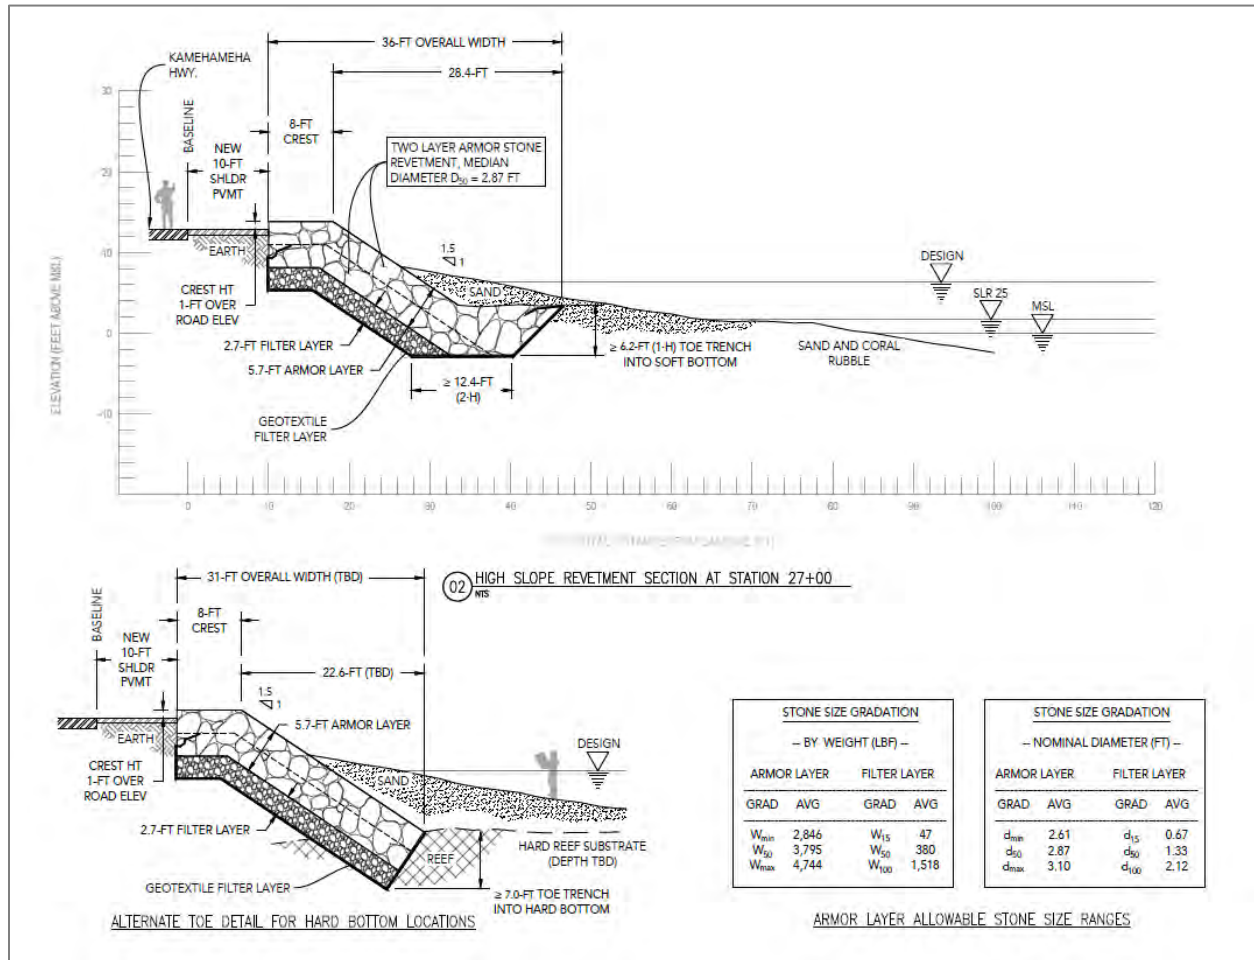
Cross section concept drawing of a proposed rock revetment structure.
